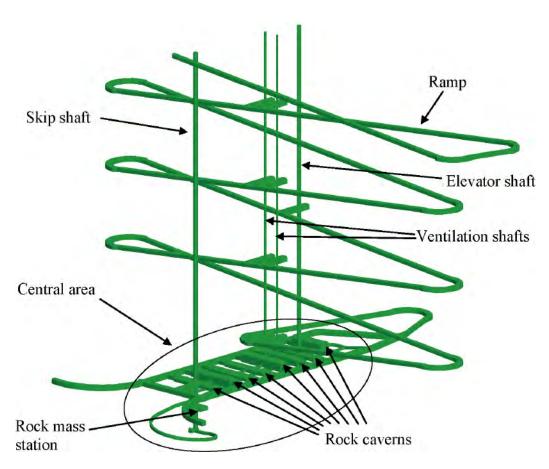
Central area and ramp, assuming the surface part of the repsoitory are located at the residential area (layouts of ramp, central area and shafts are given by SKB).
